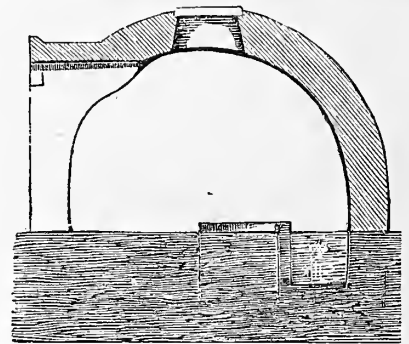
SECTIONAL VIEW OF SPRING HOUSE.
